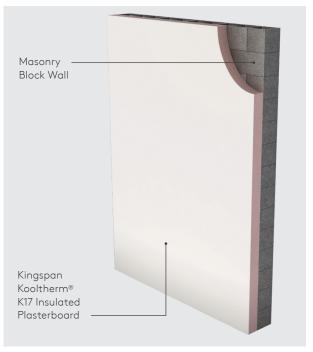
Adhesive Bonding to Masonry Block Wall (140 mm).
